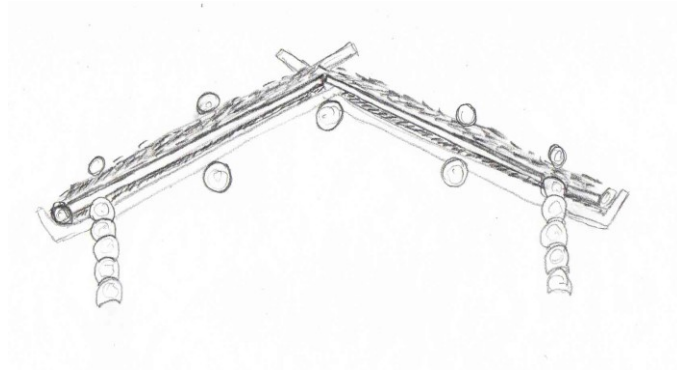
Iron Age house section sketch. In the Iron Age, houses in Tursiannotko did not have a separate wooden floor and the main material for the house constructions was wood.
